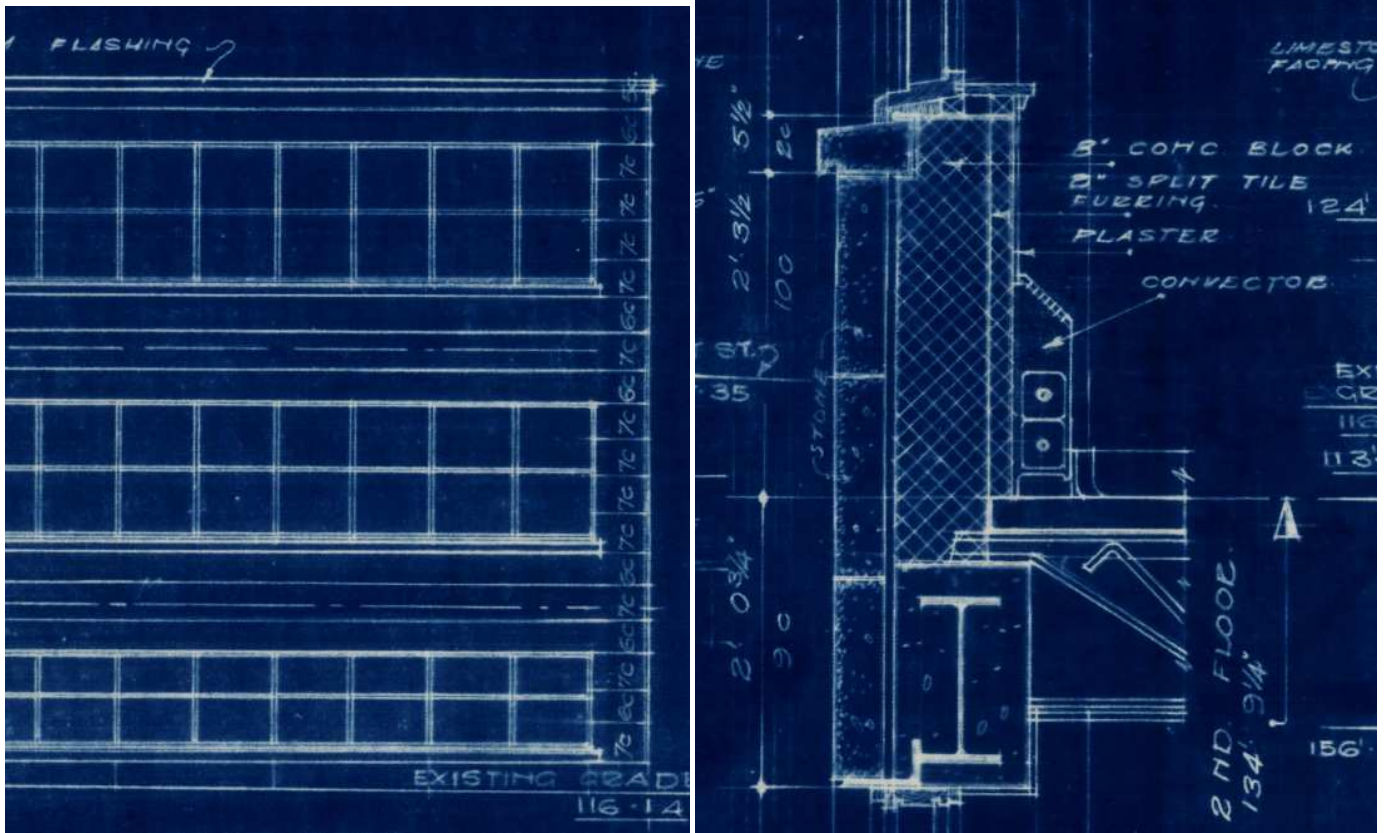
(left): Detail section through the walls clad in limestone illustrating the structural frame and materials and their relationships. Note the windowsill that is supported on the masonry back-up wall as well as the relationship of the aluminium windowsill to the limestone sub-sill. Source: 1955 Architectural Drawing Set A4.
